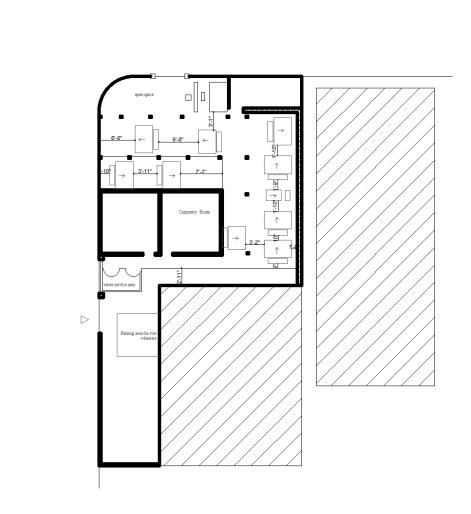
Site plan of Chaubise Dhaka Kapada Udhyog
